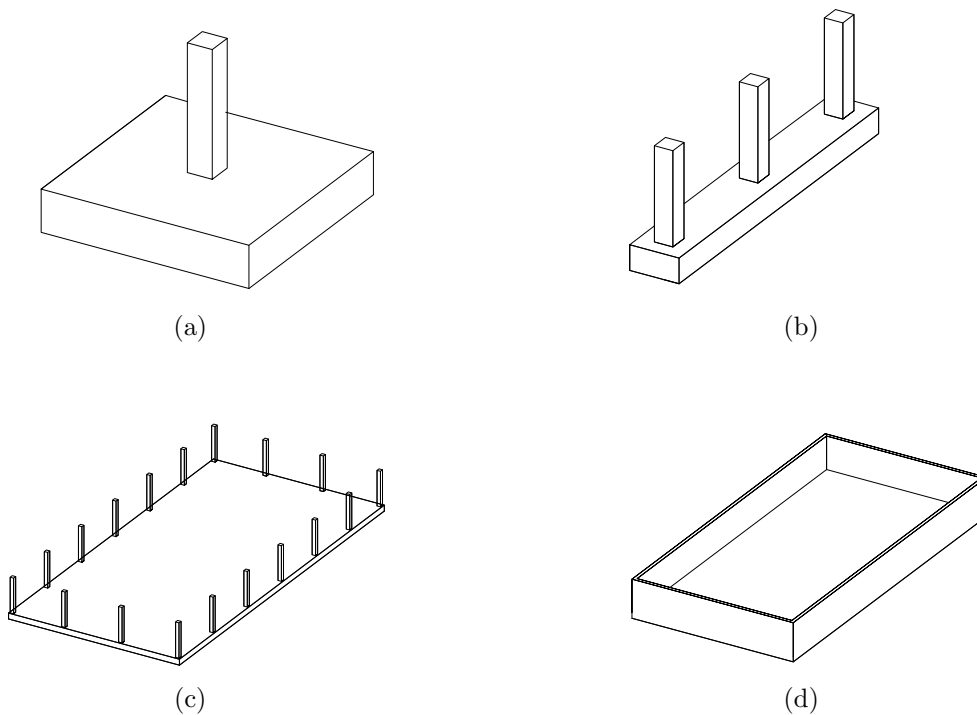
(a) *Pad foundation*, (b) *Strip foundation*, (c) *Raft foundation*, (d) *Basement foundation*.
